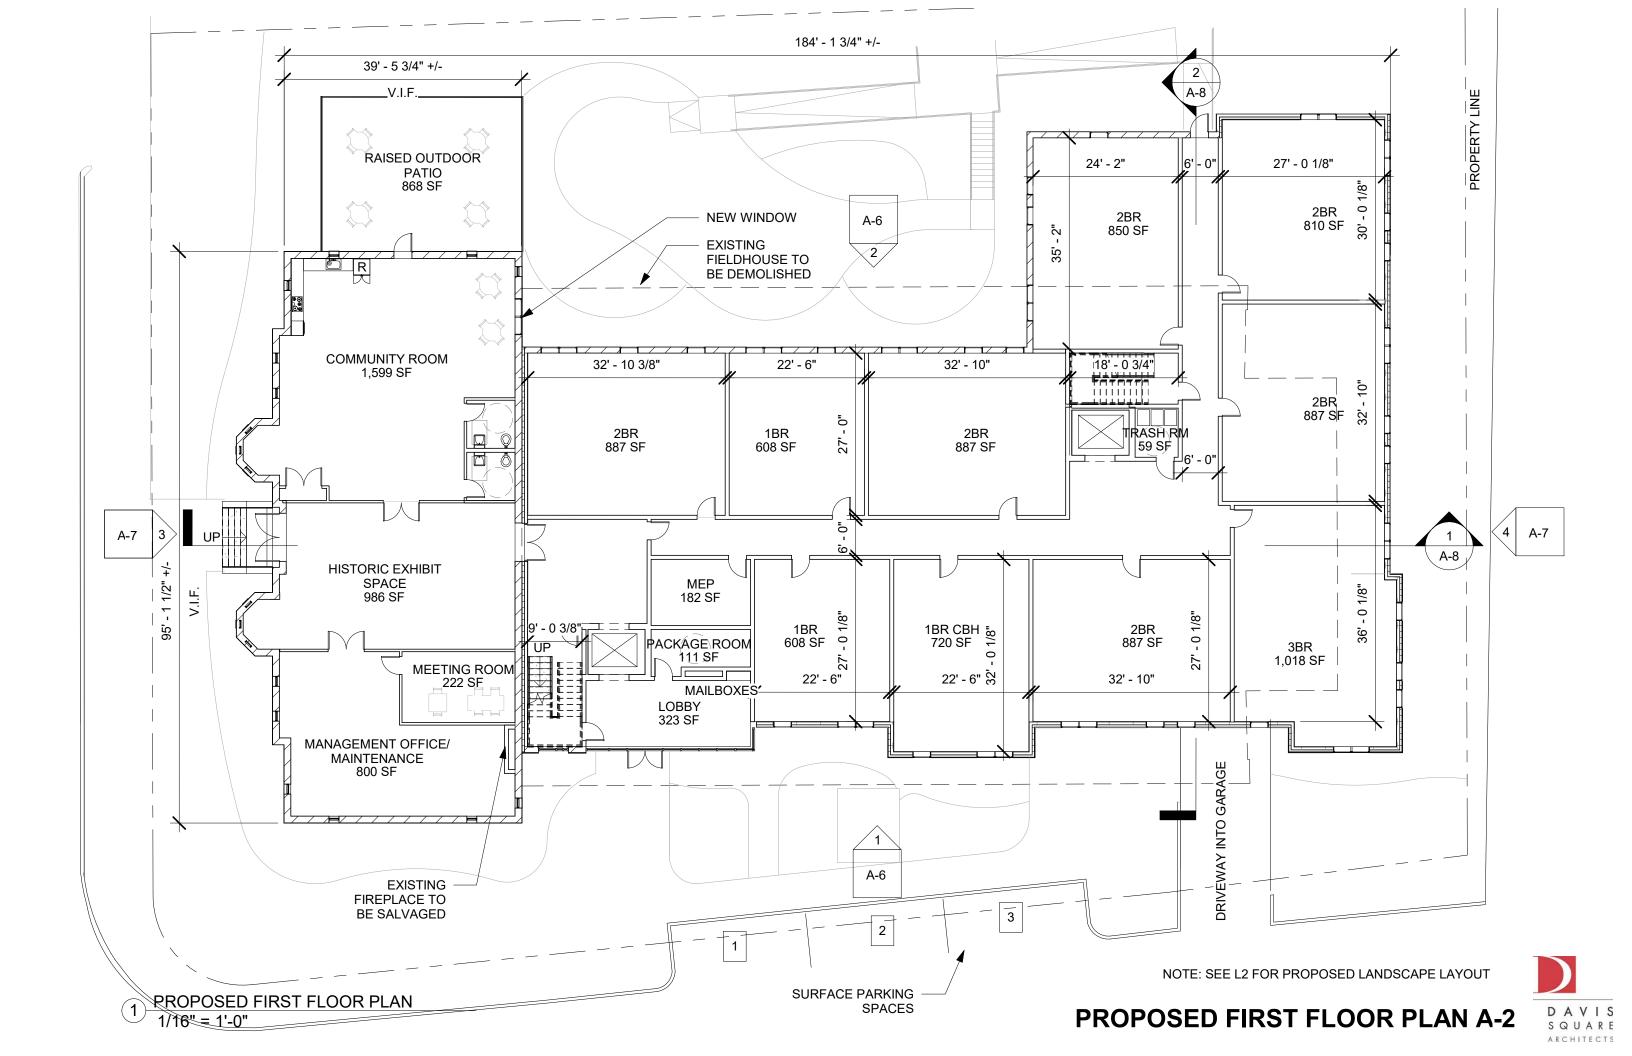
Conceptual Design Drawings + Site Plan + Exterior Elevations
